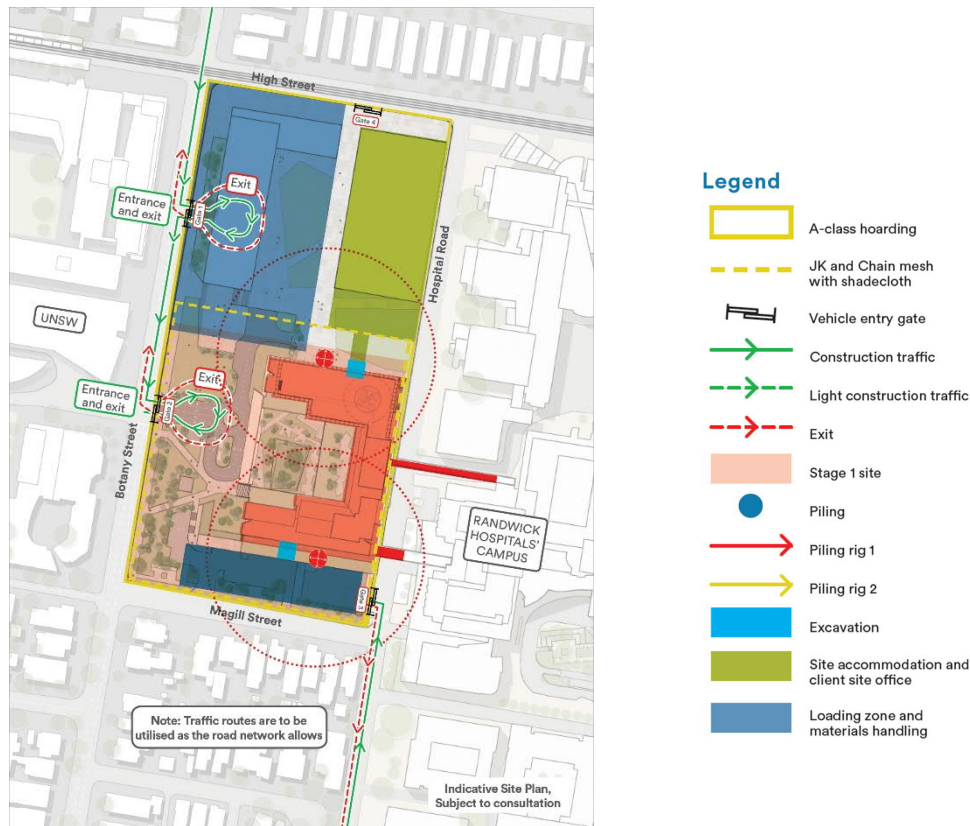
Site establishment plan CC2 and CC3, left in, right out
